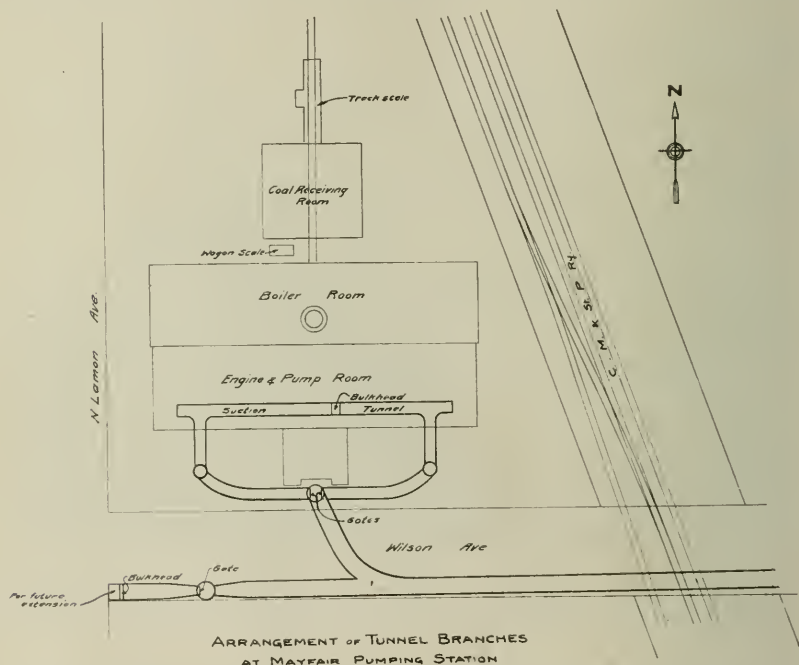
Connections of Tunnel at Mayfair Pumping Station, Wilson Avenue Tunnel System.
